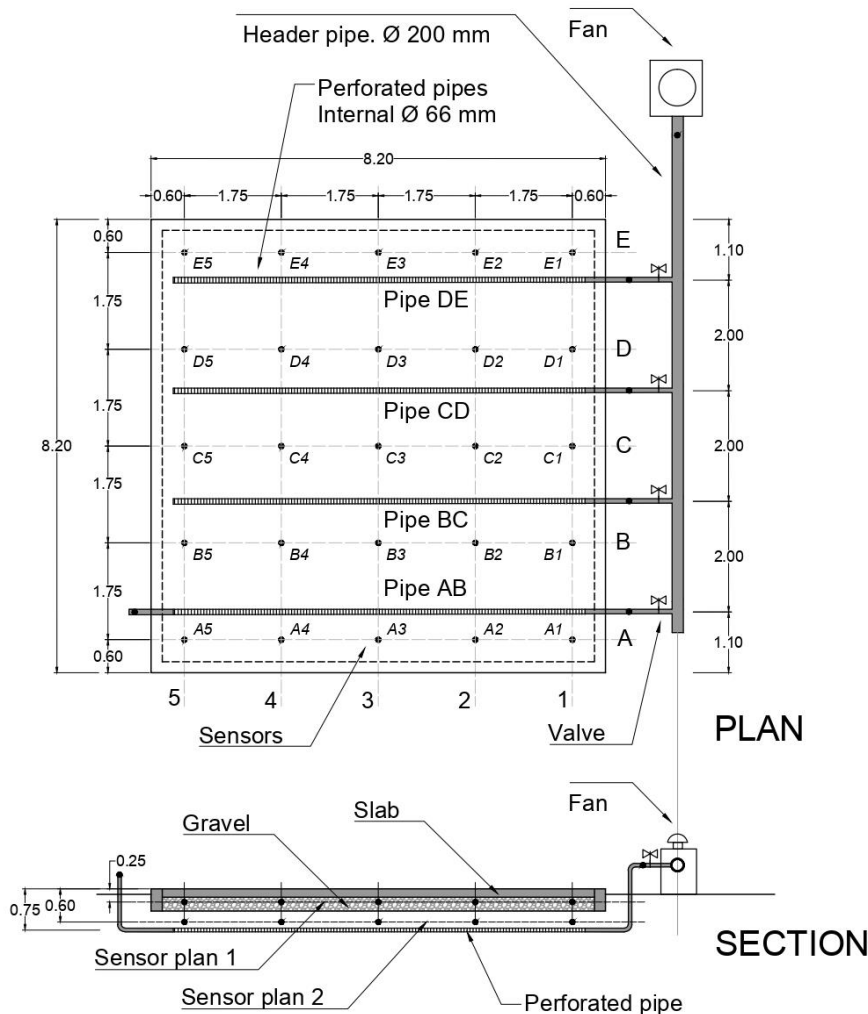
Plan and section views of the slab with the measuring point grid, showing depressurisation system consisting of underground perforated pipes, an above-ground collector pipe and a mechanical extractor fan. (dimension in m)
